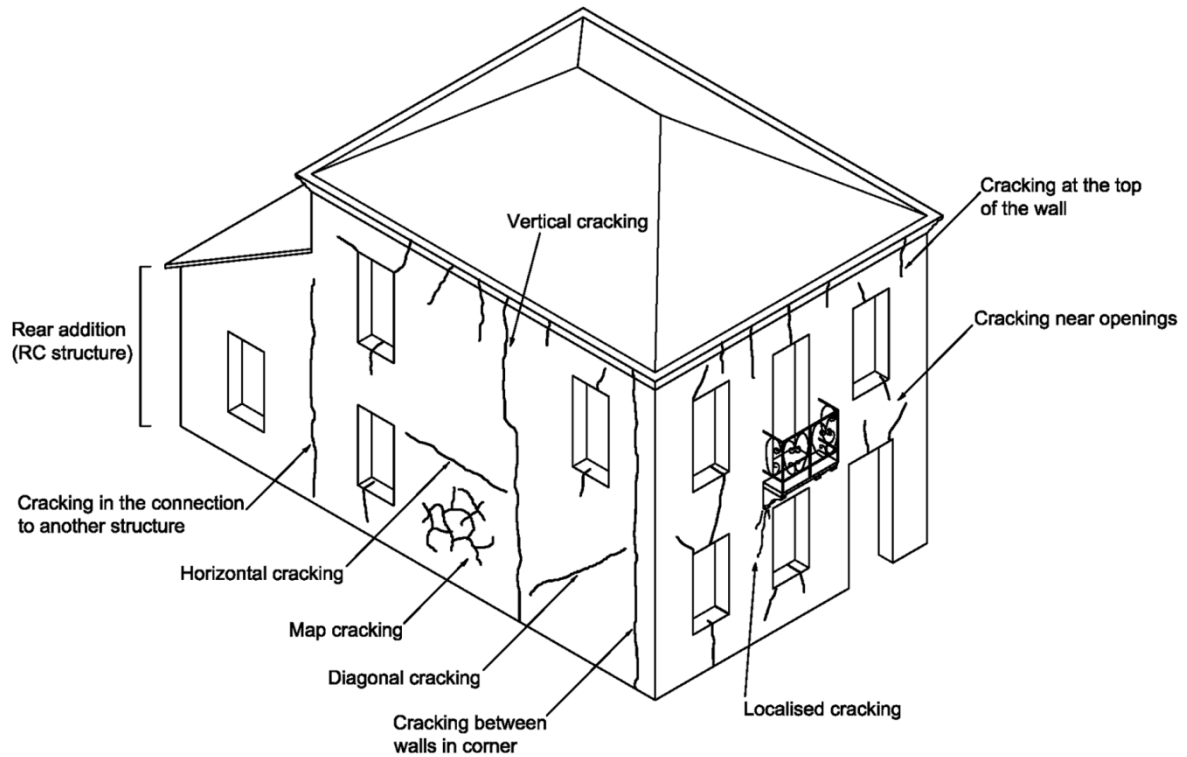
Schematic representation of the types of cracking observed in facade walls.
